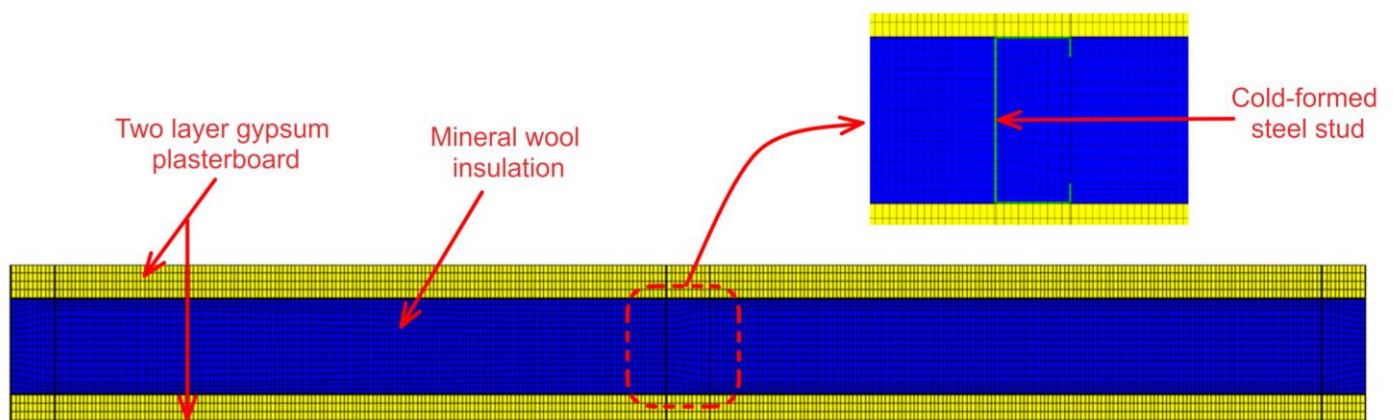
2D thermal FE model of LSF wall section (with cavity insulation)
